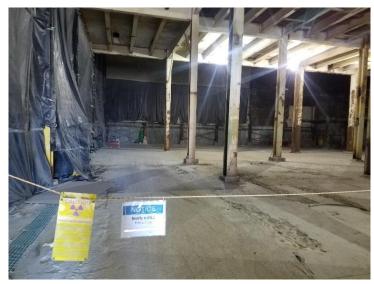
1st Floor restricted area with rope and Rad Materials Area signage, looking east
